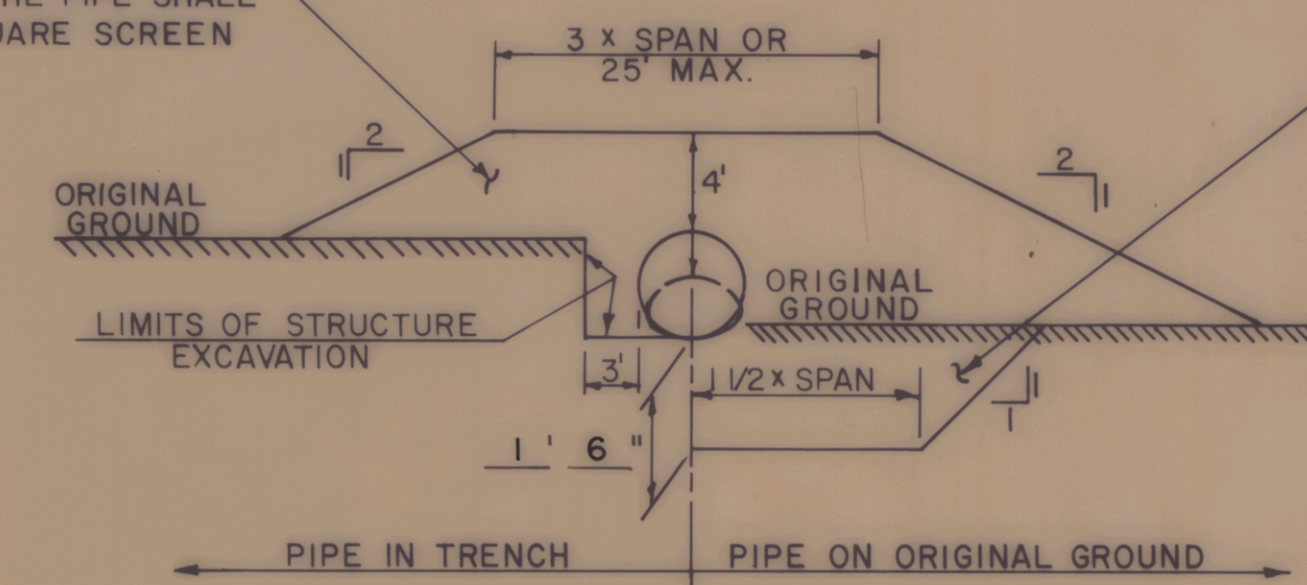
DETAILS OF STRUCTURAL PLATE PIPE CULVERTS
